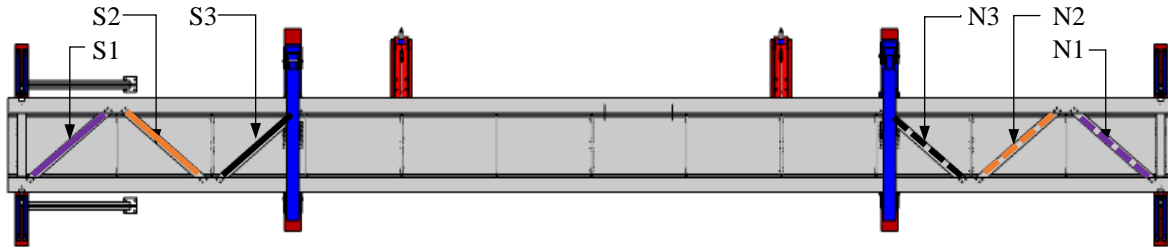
Top Lateral Truss Labels - Plan View (*N and S referring North and South supports*)
